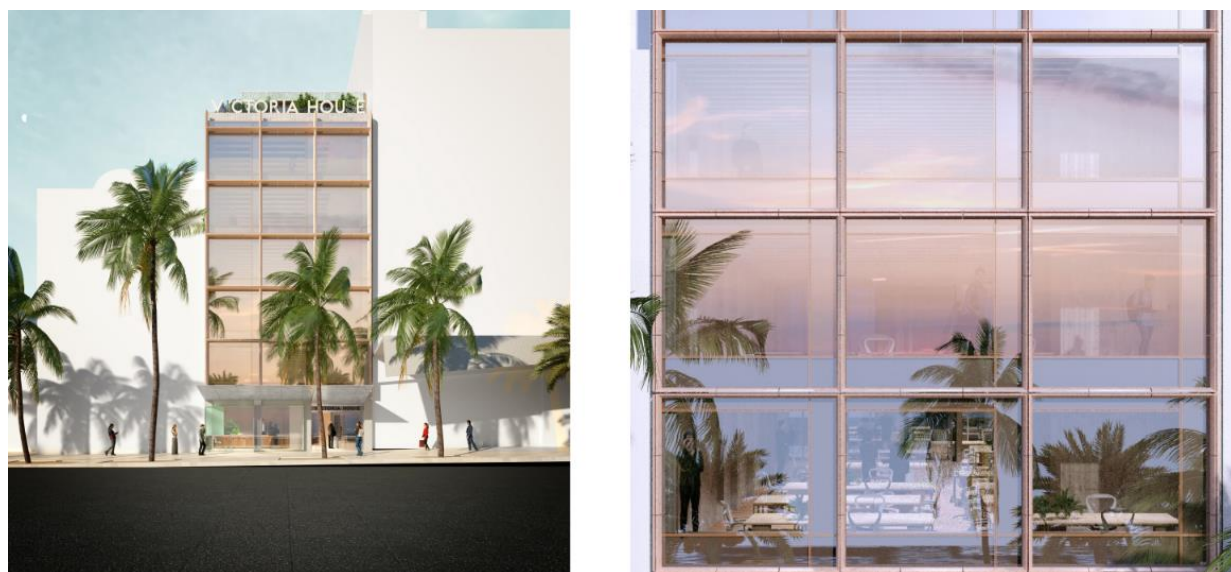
West Elevation view from Moorabool Street and detail of western facade
